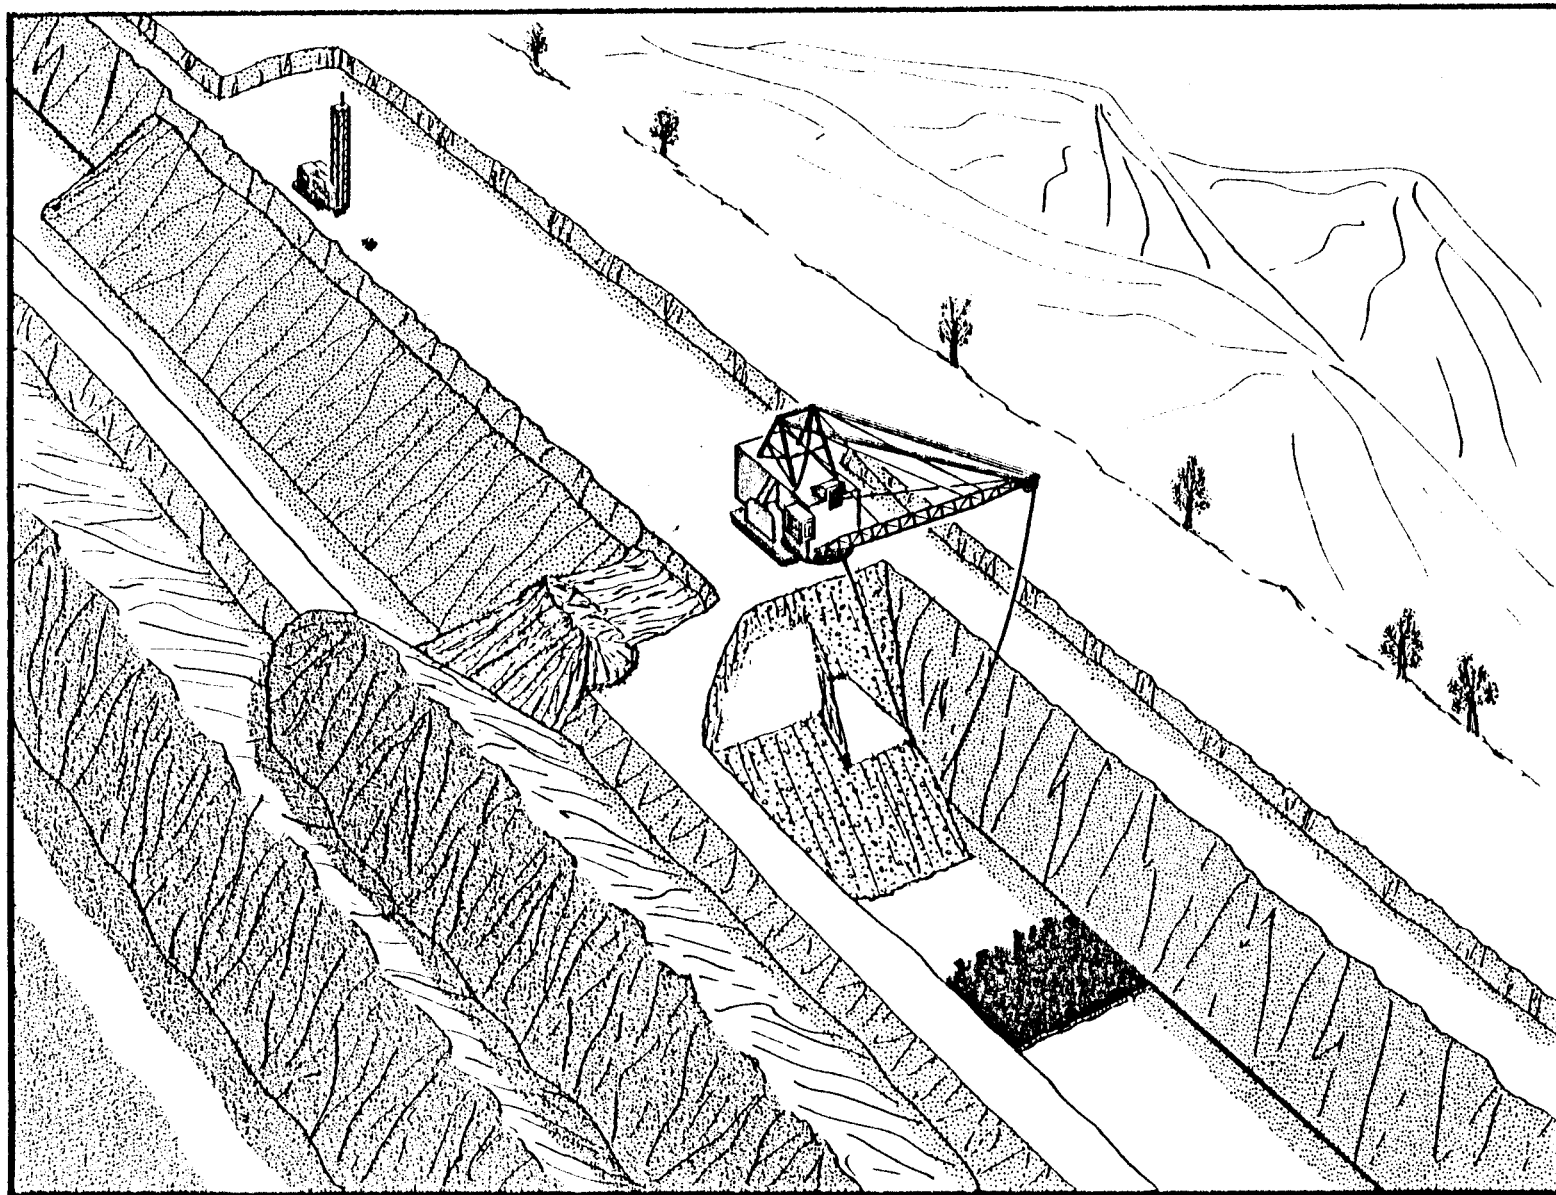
Step 2: Digging and Widening the Keyway and Building the Extended Bench
